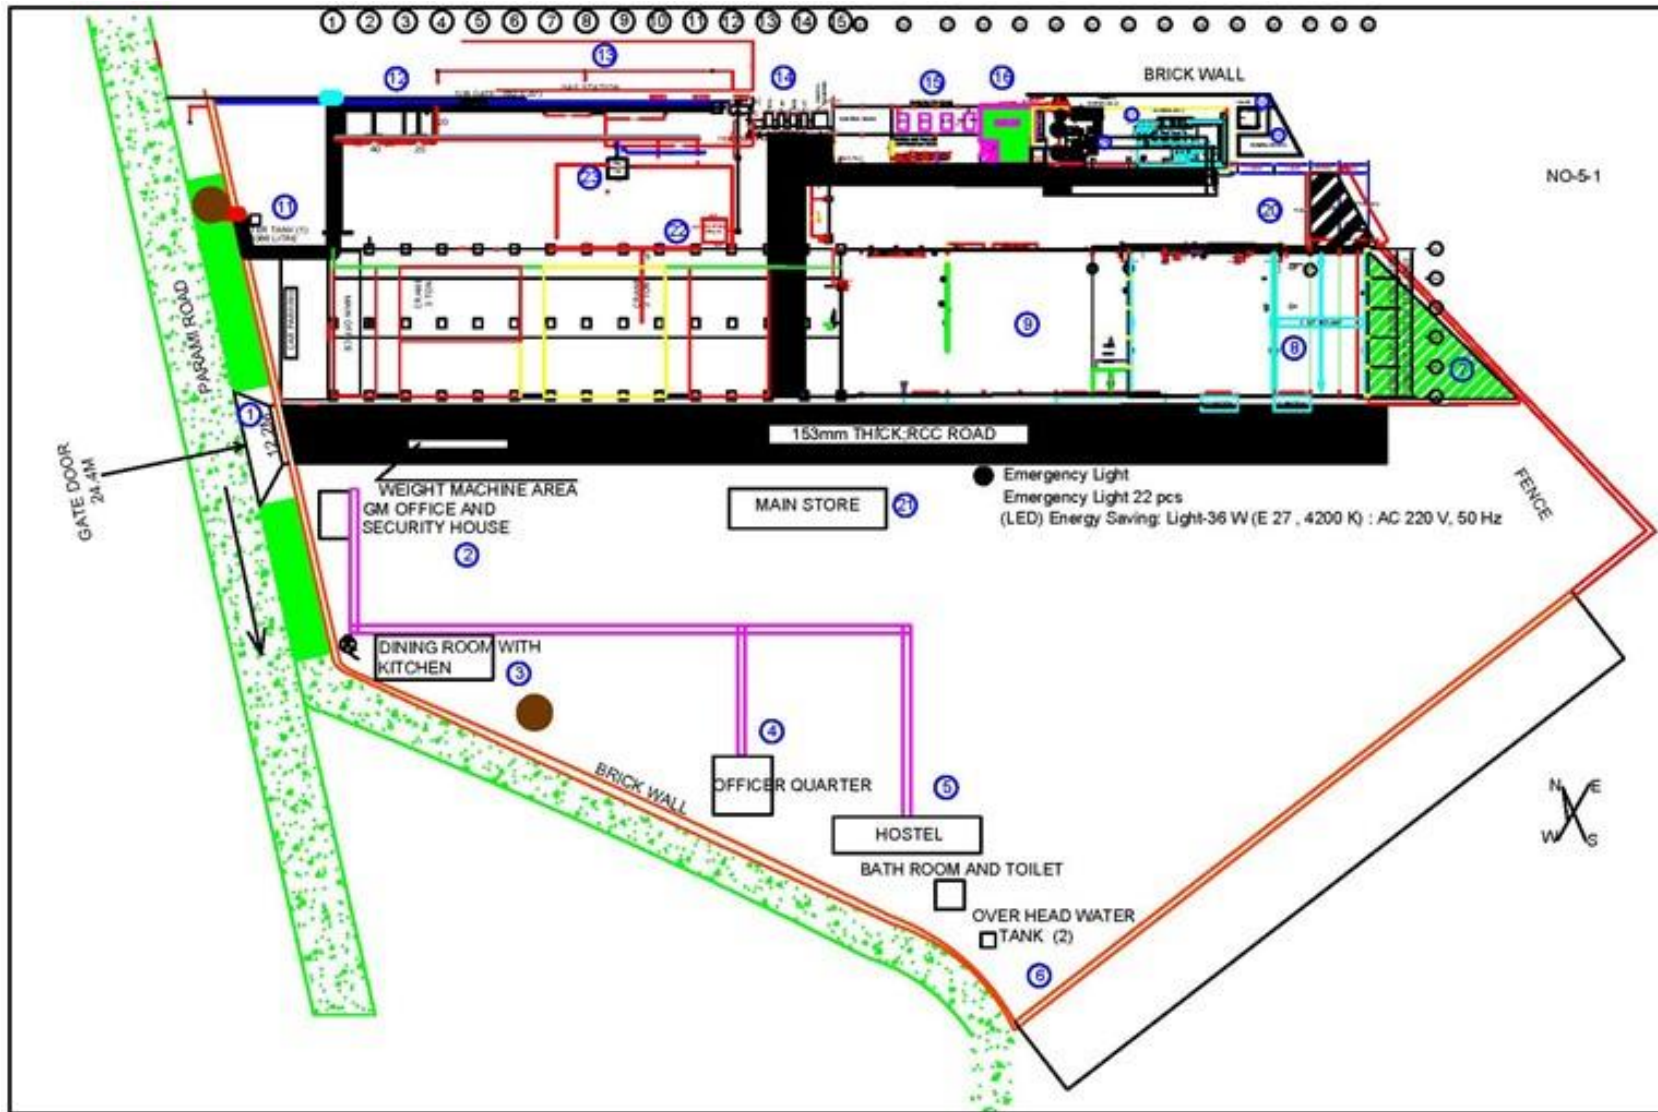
Factory Drainage Pipe Plan of Yangon Metal Industry Co., Ltd.
